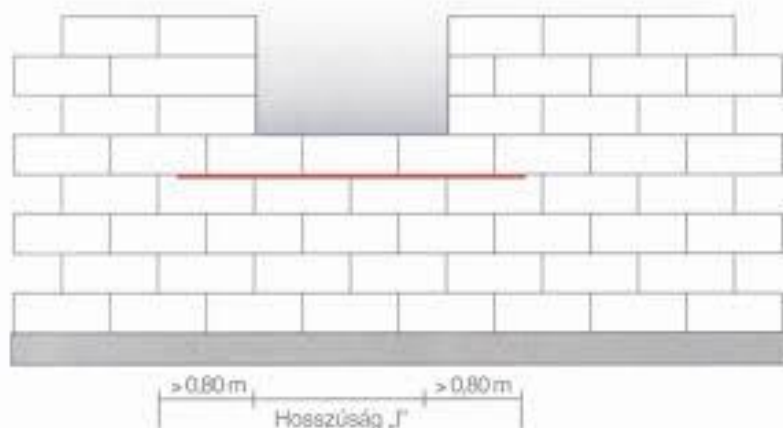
installation of a steel reinforcement bar in the parapet wall
